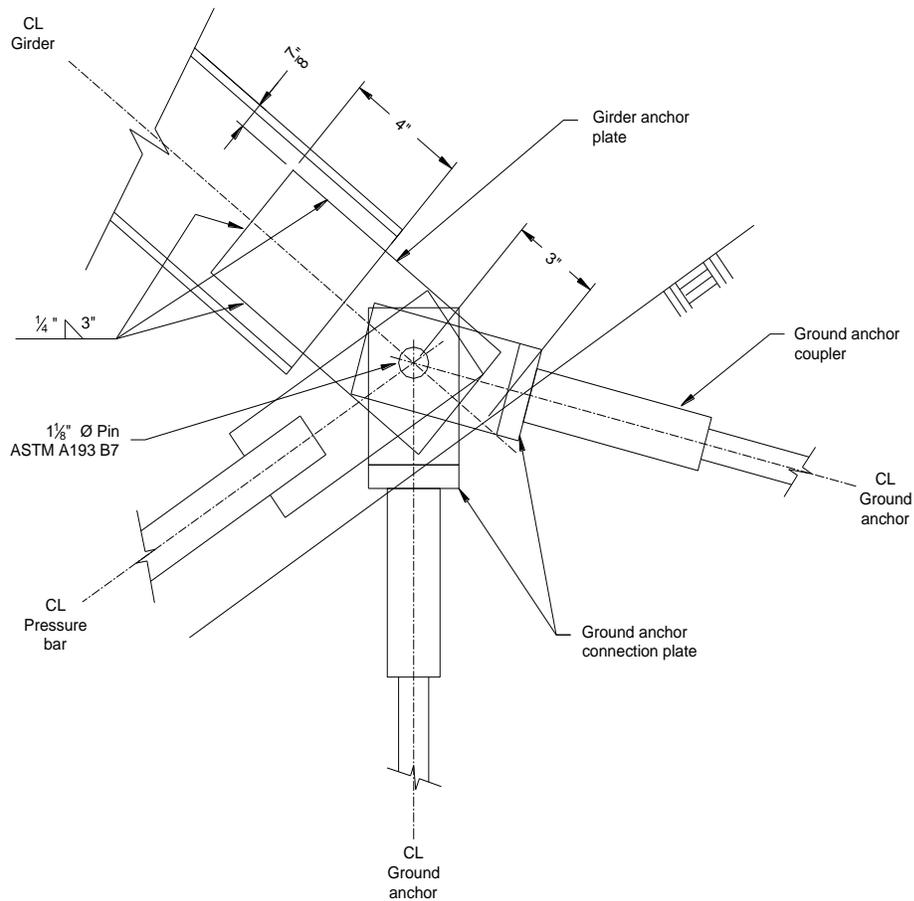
Snow supporting structure upper girder foundation and connection to ground anchor for case of ground anchor foundations.
